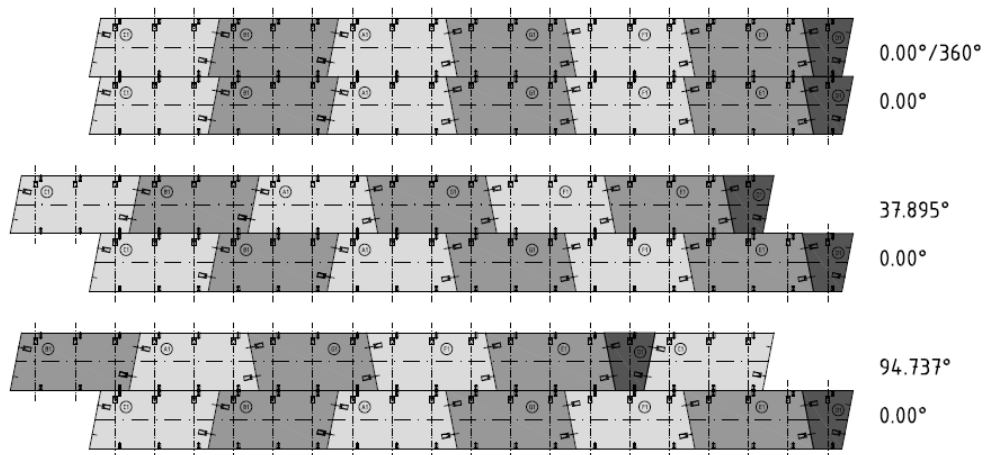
TBM tunnel not allowed rotations in trapezoidal precast segment. Cross Joint
